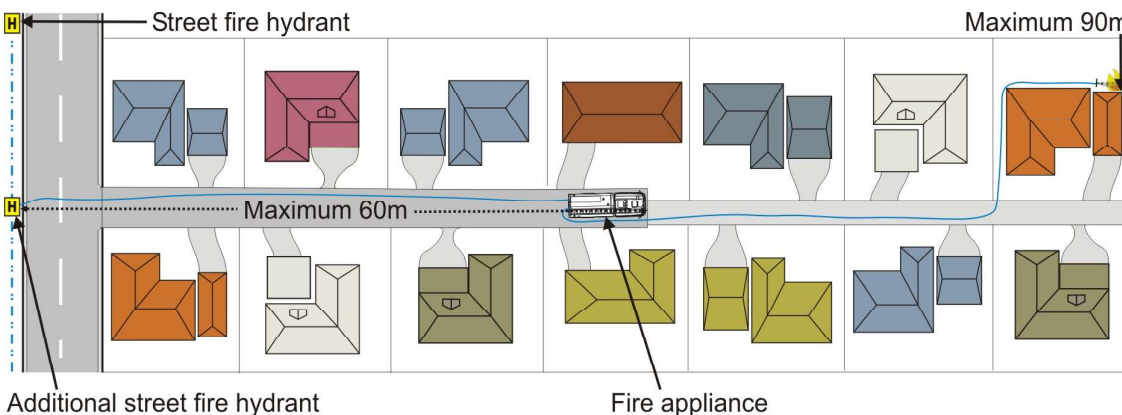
Example of additional street fire hydrant for maximising carriageway length
